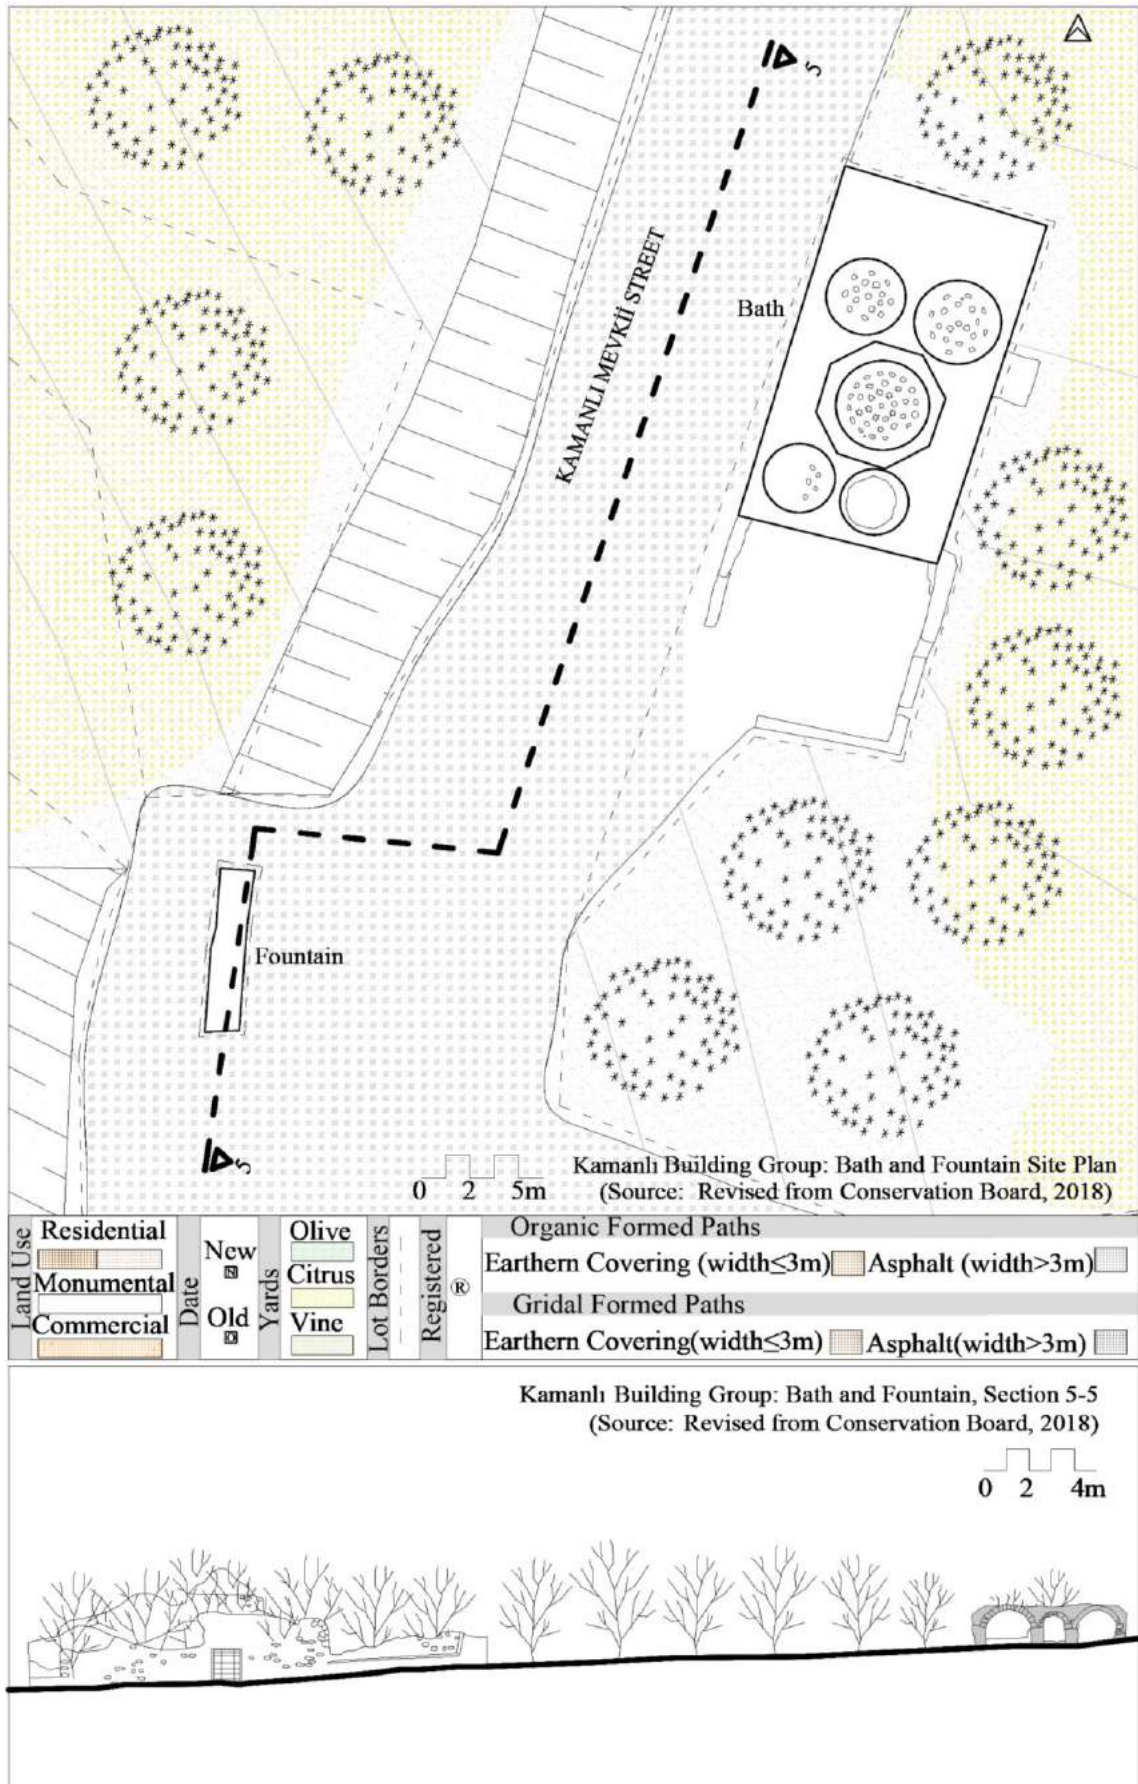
Site plan and silhouette section, Kamanlı bath and fountain
